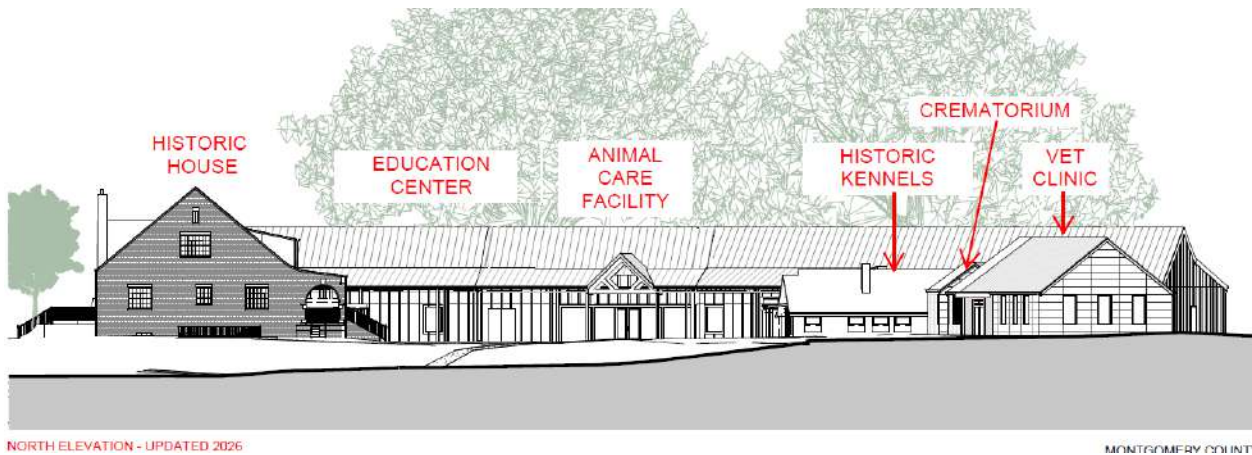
Schematic north elevation showing the historic buildings and proposed new buildings.
